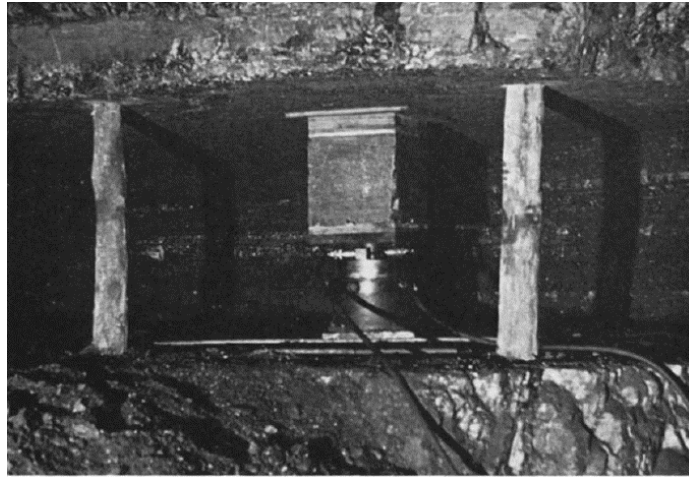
Loading arrangement for underground testing of medium-sized coal specimens (after Bieniawski, 1968).
